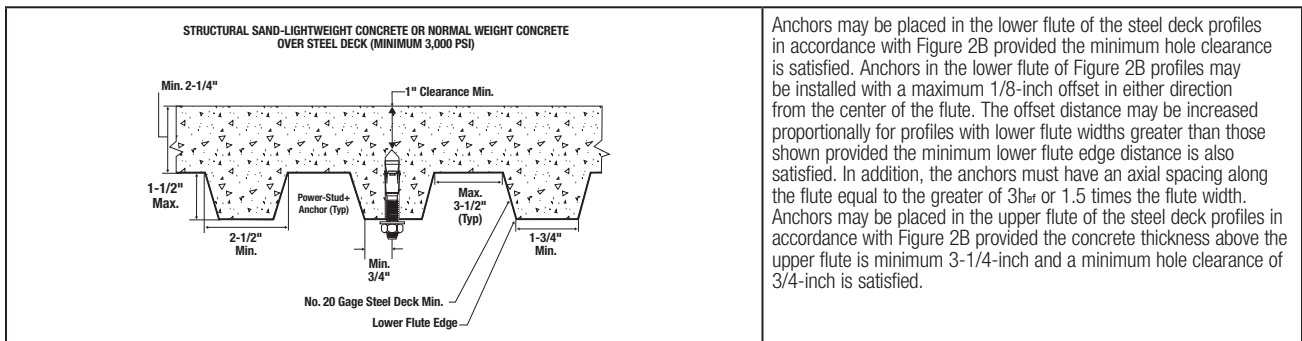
B - Power-Stud+ SD1 Installation Detail for Anchors in the Soffit Of Concrete Over Steel Deck Floor and Roof Assemblies (See Dimensional Profile Requirements)
